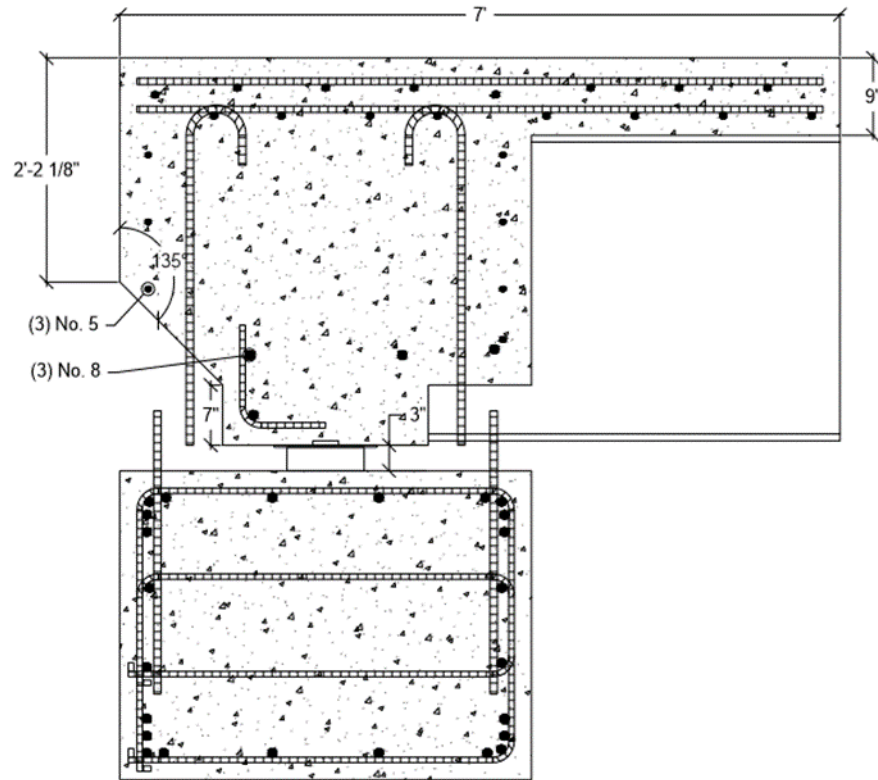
UHPC-Joint specimen section through “chimney.”
